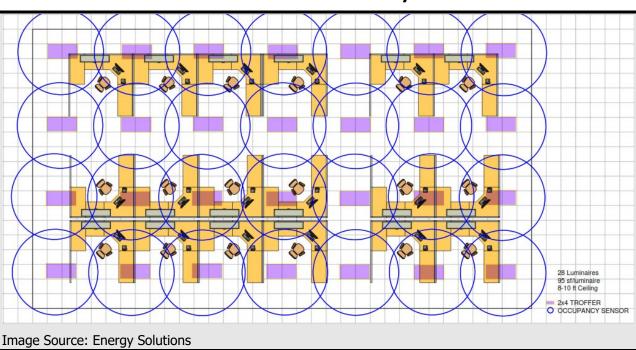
(for Example 5-8): An Office Plan With Occupant Sensing Control Zone Layout
